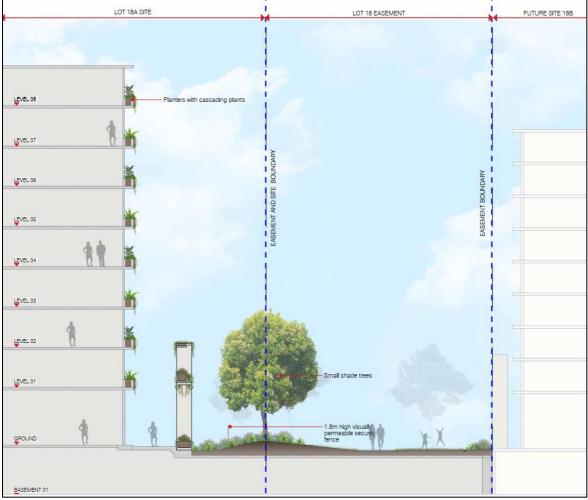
Proposed landscaping outcomes in cross-block link (Source: Dunn and Moran Landscape Architects)
